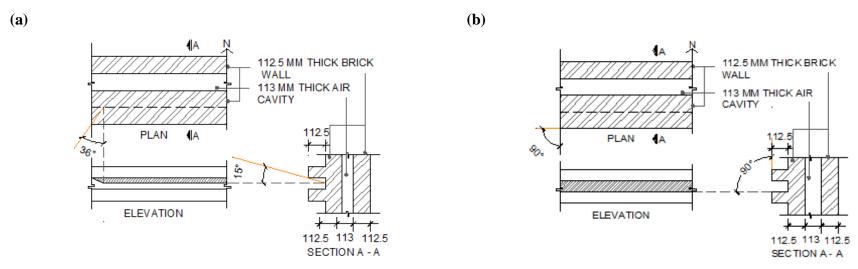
Shaded wall area for one brick course of east wall on 22nd December (a) At 0800/1600 hours (b) At 1200 hours
